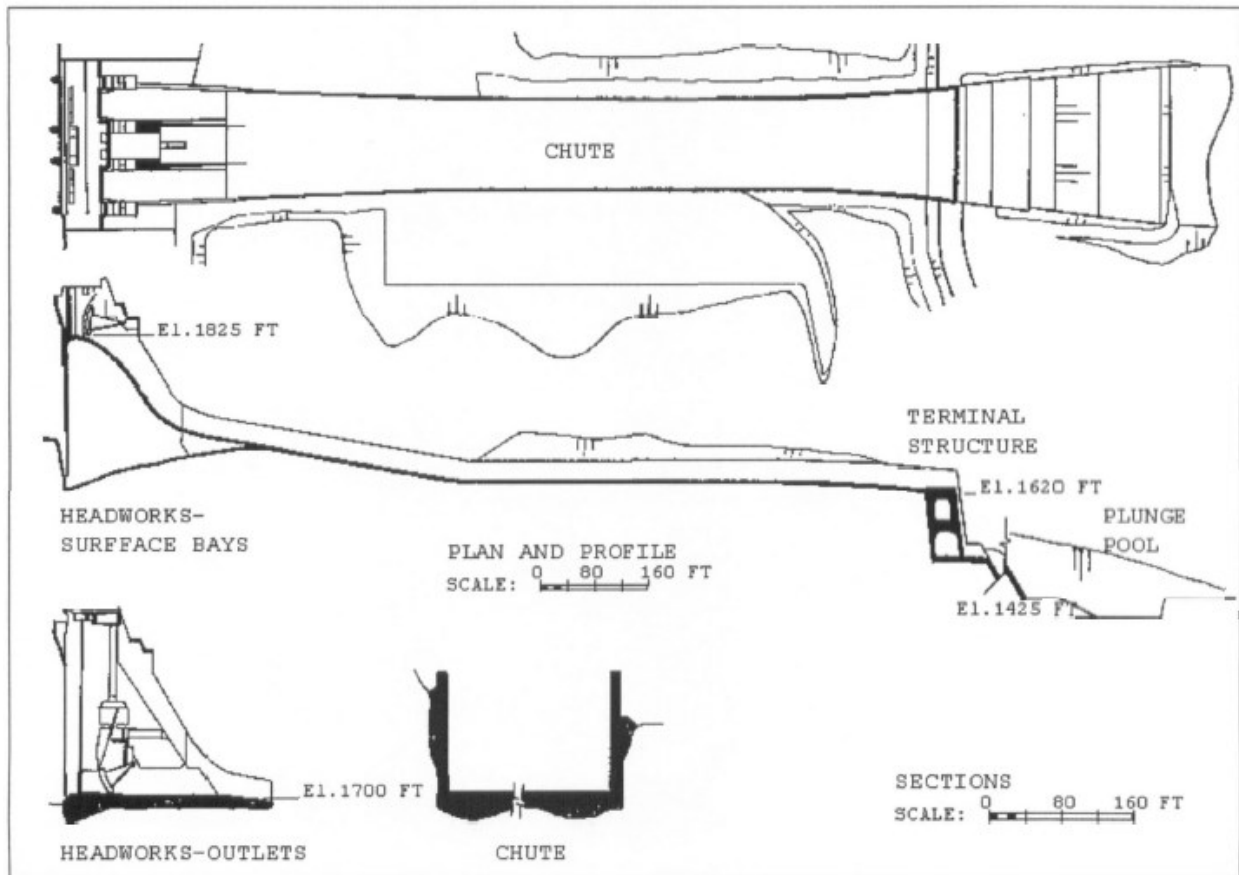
Revelstoke Dam spillway structure plan and profile, showing crest, outlet, and pre-excavated plunge pool elevations (Monfette, 2004); low level outlet gates shown in lower left of figure
